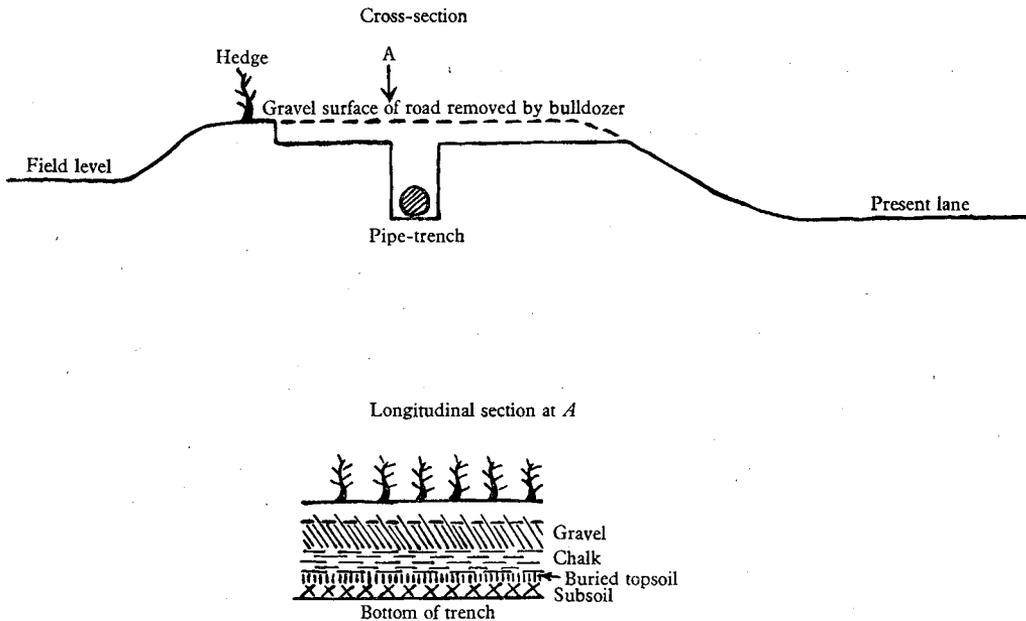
Cross-section of Wool Street at Worsted Lodge, looking north-west, and longitudinal section of full depth of *agger*. Scale: 1 in. = 8 ft.
